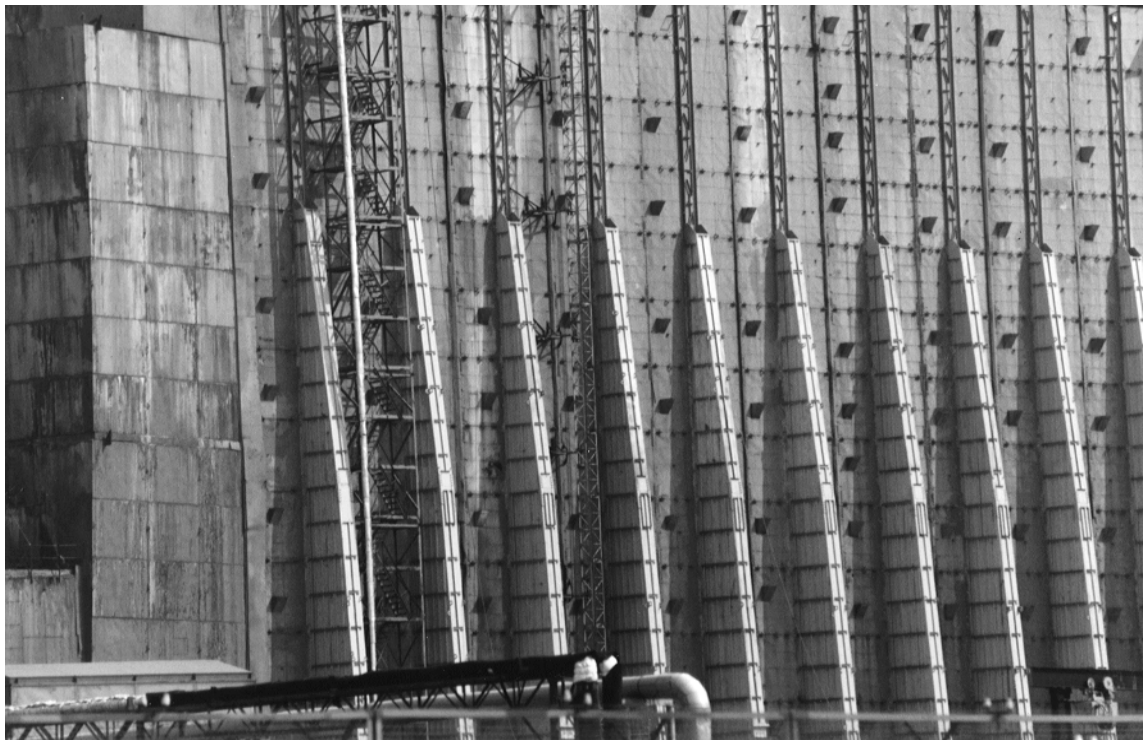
Support structure for concrete roof placed over damaged reactor
